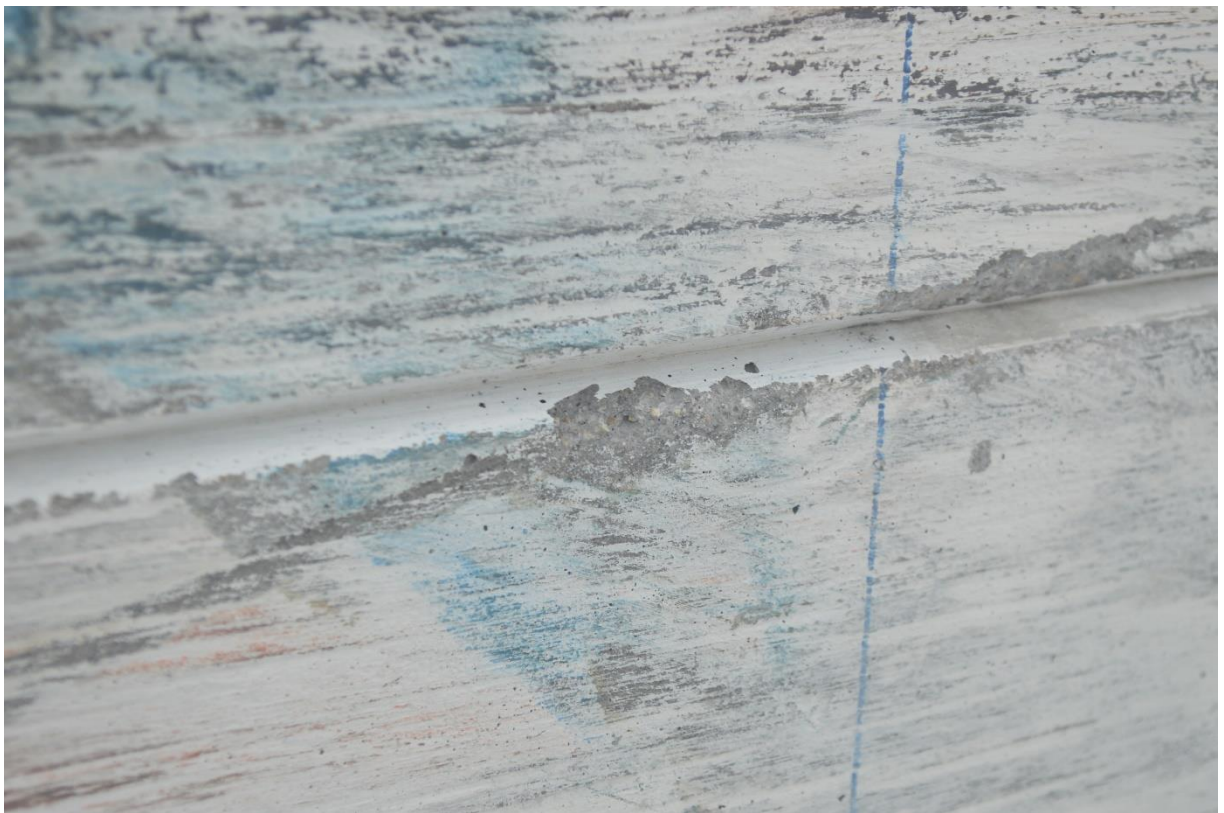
System Damage due to Wheel Contact, Test No. H42S-2
